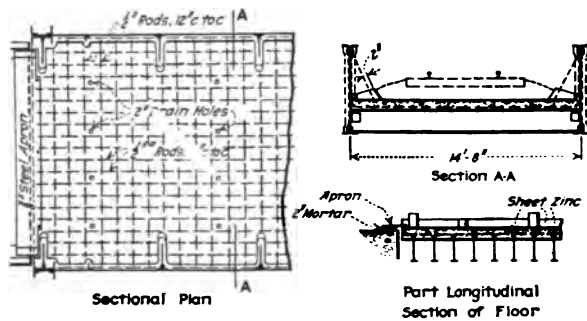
Reinforced-concrete floor for through plate-girder bridge, C. B. & Q. R. R.
